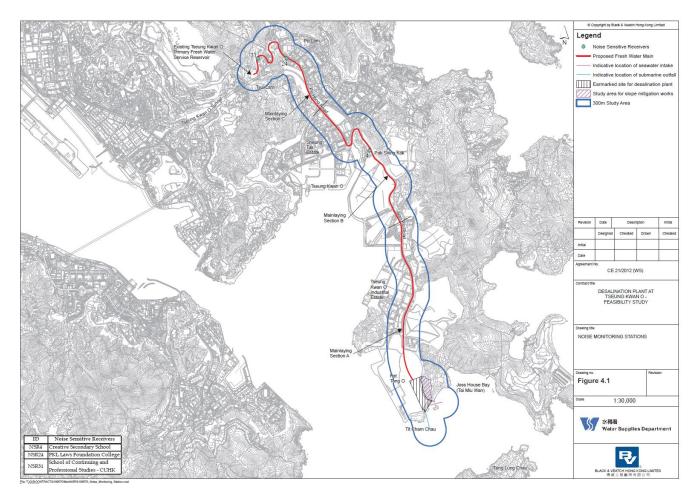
Site Layout Plan with Noise Sensitive Receivers and Desalination Plant
